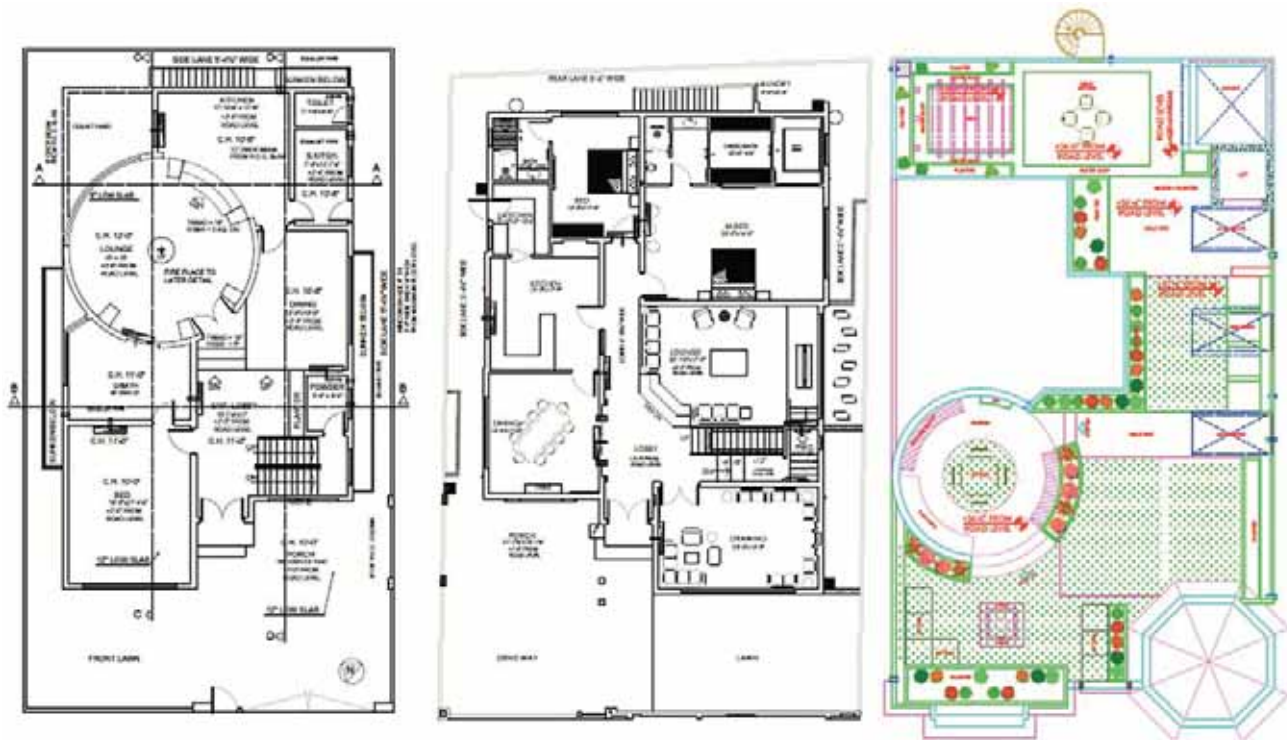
4500 sq. ft. Area House Designs with Courtyard, Cross Ventilation, and Roof Garden Concepts. (Source: Galleria Design)
